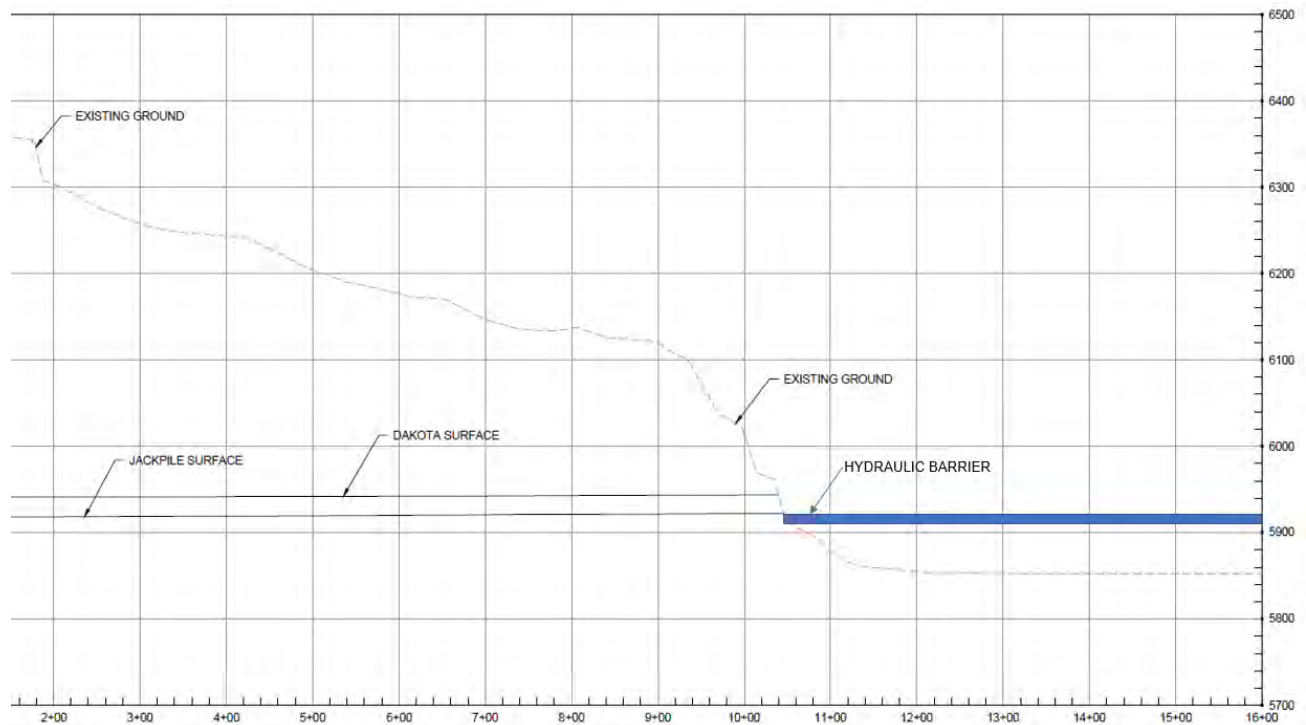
Conceptual Cross Section of Pit 1 Showing Hypothetical Hydraulic Barrier
